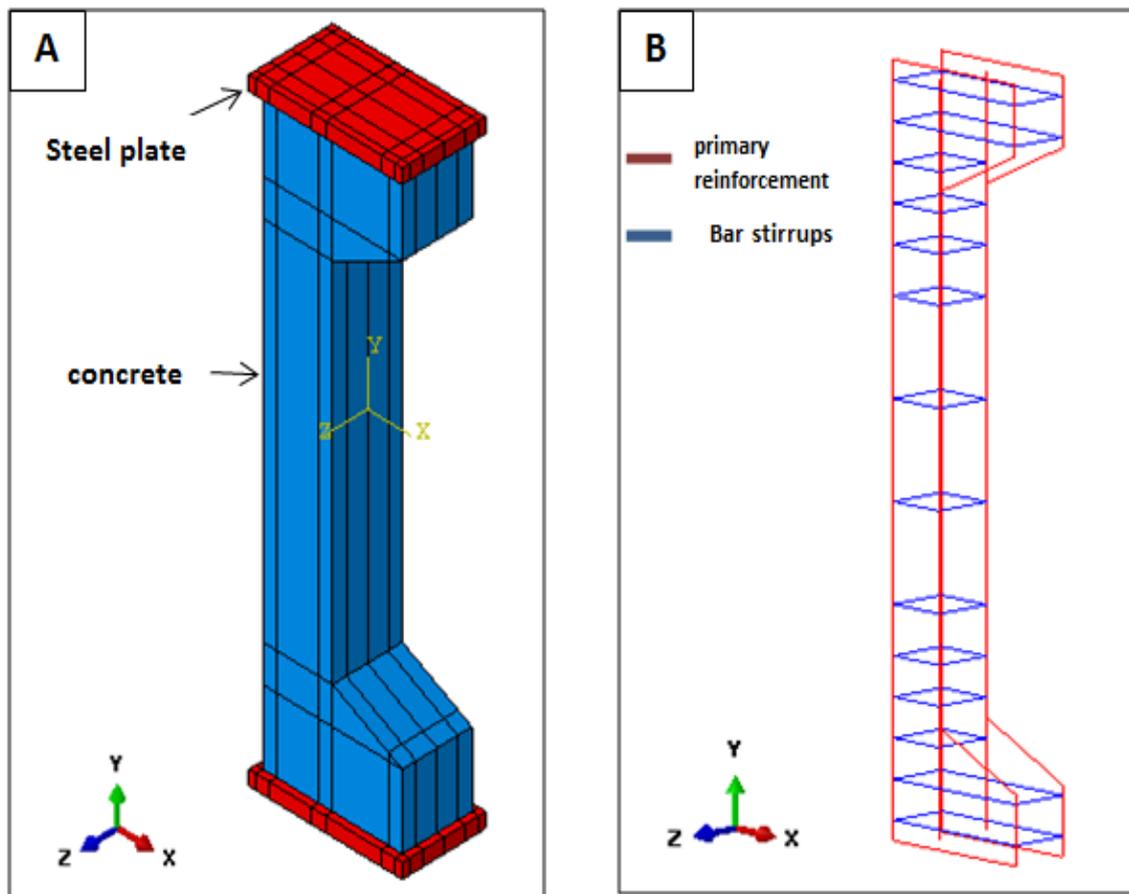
The materials used (A) Concrete and steel plates (B) Steel reinforcement
